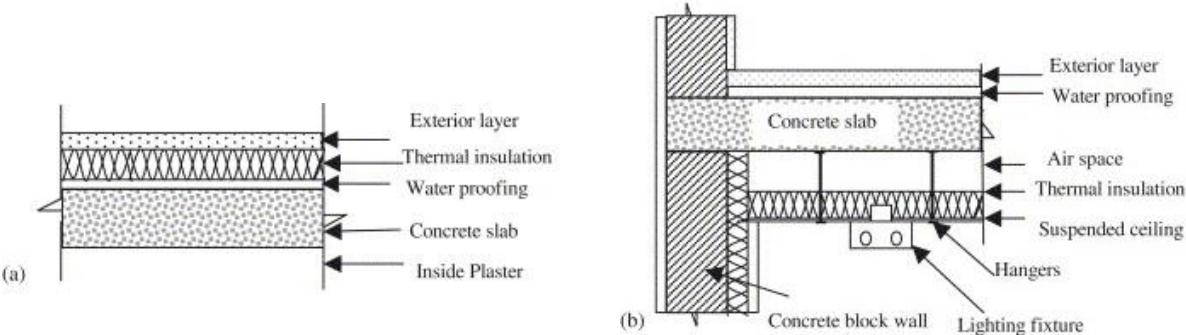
Strategies for installing insulation on roofs. a) Roof insulation in concrete structure, b) Roof insulation in suspended ceiling.
